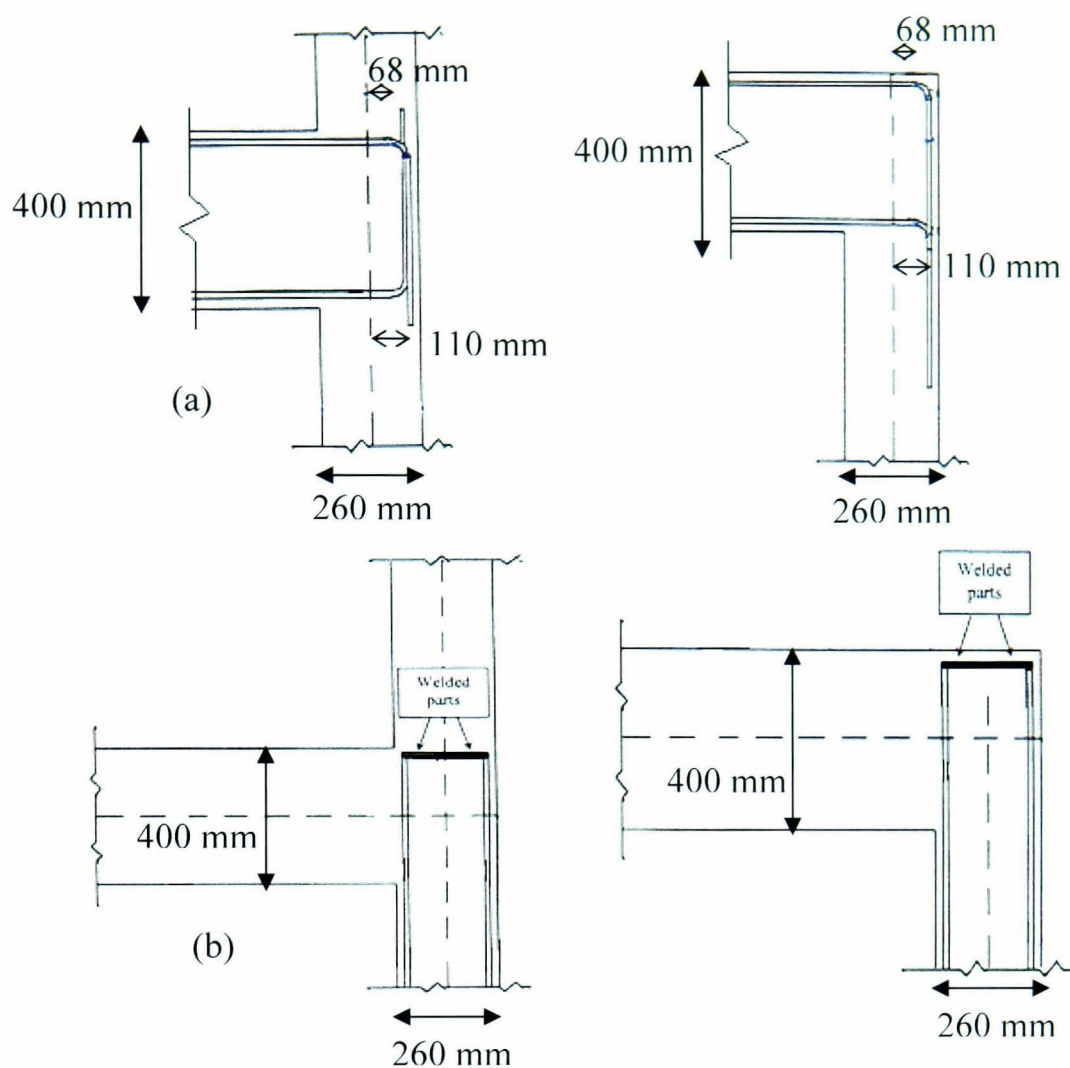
Anchorage details of 1st and 2nd storey (a) beams, and (b) columns (Chaudat et al., 2006).
